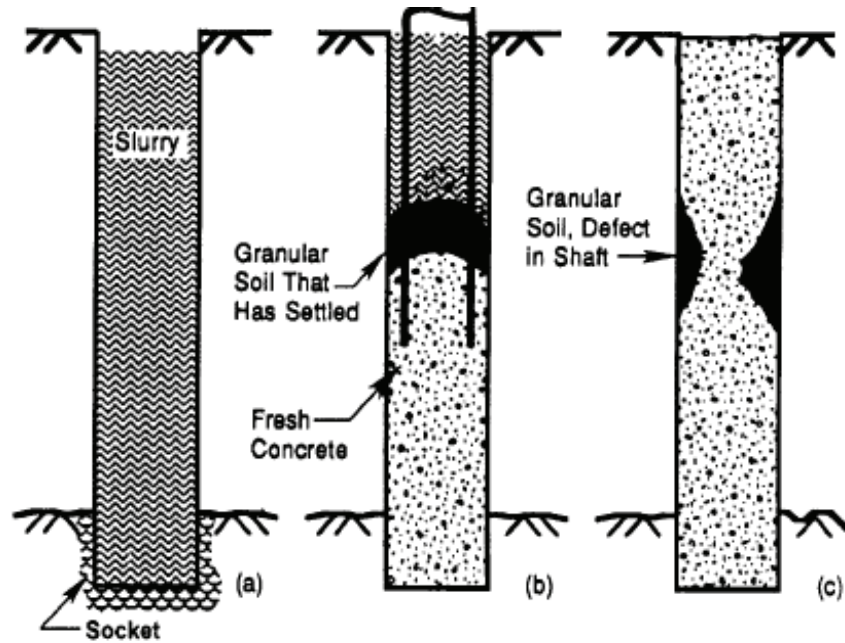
Placing Concrete through Heavily-Contaminated Slurry
